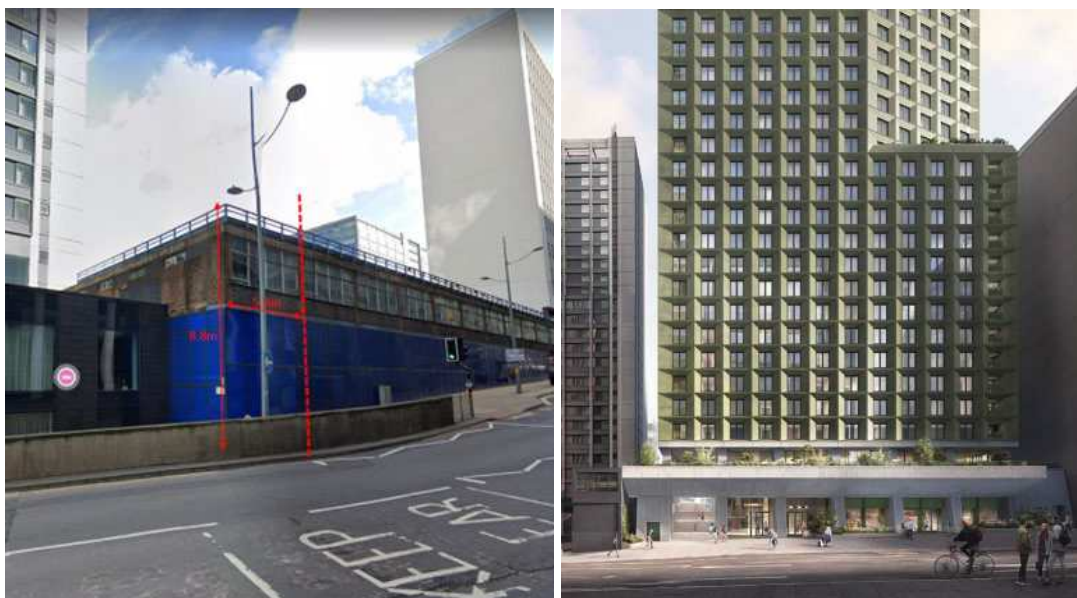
Existing building with the retained bay highlighted and Proposed scheme if the bay is retained
